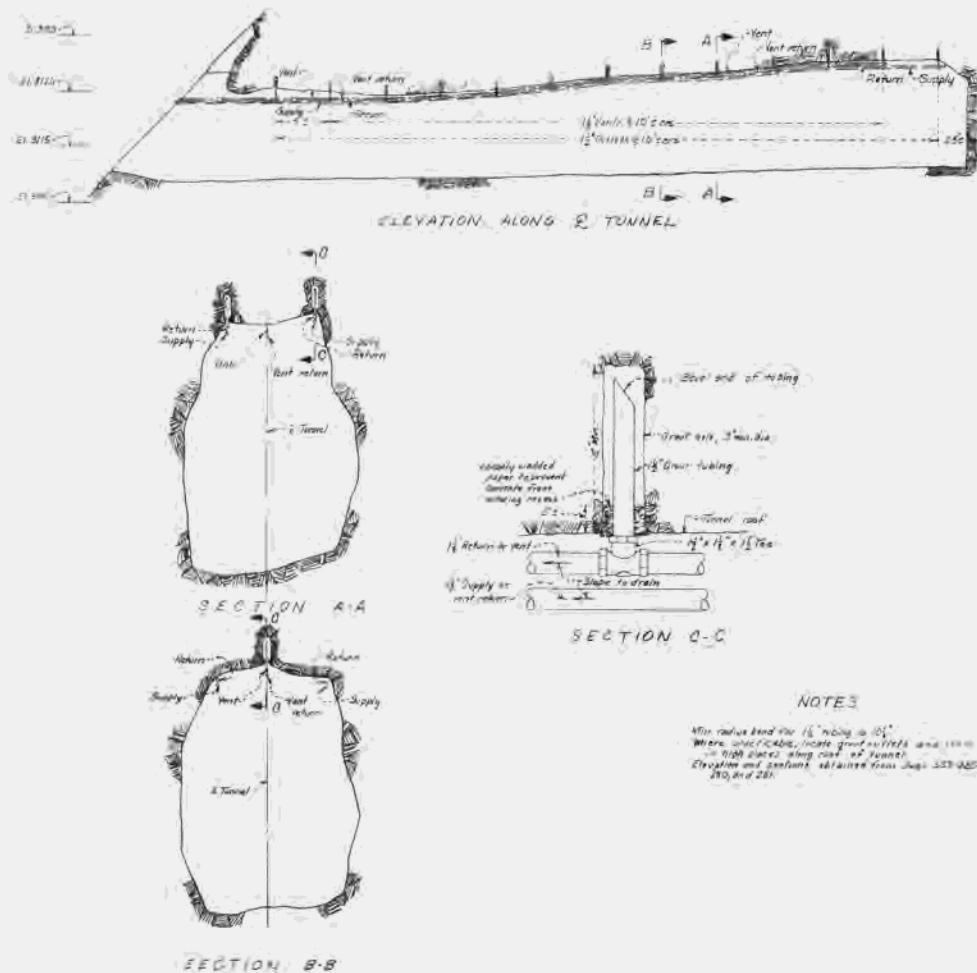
Dam exploratory tunnel, right keyway—Elevation 3118 grouting system. From drawing No. 557-D-2140.
